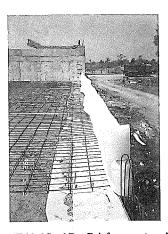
Welded Steel Bar Reinforcements and Nonwoven Heat-Bonded Geotextile Filters
